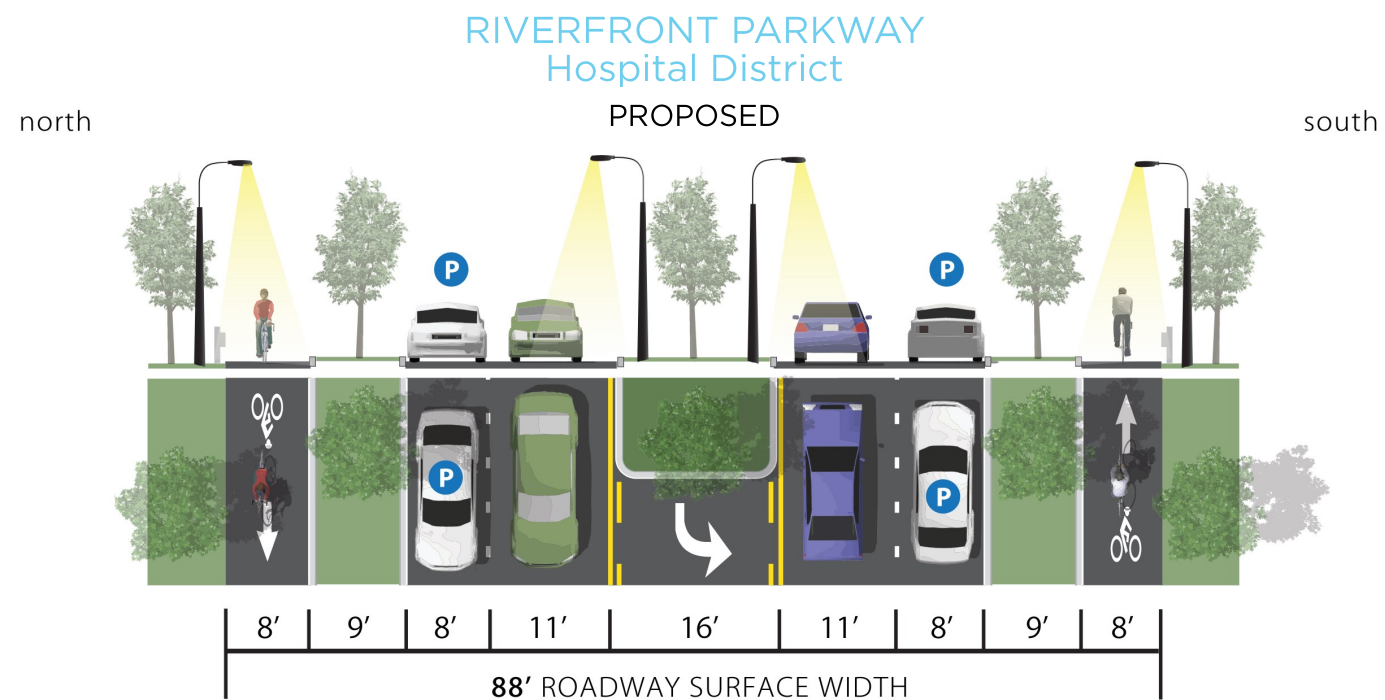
Riverfront Parkway Cross-Section | Hospital District, Proposed
